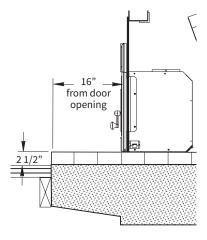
Minimum raised hearth requirement. Riser Bar not required.
